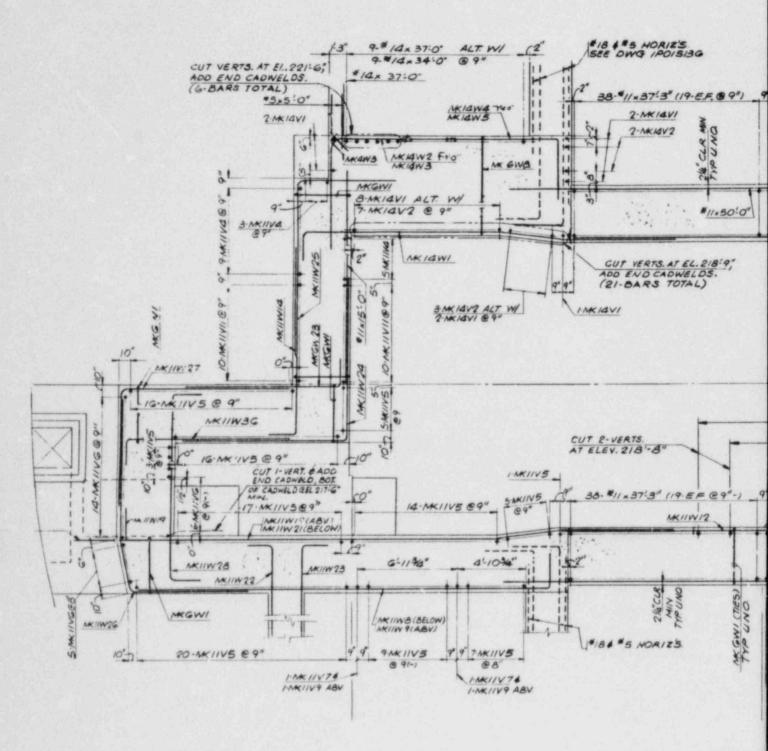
SSW DESIGN DETAILS (Sheet 3 of 5)
